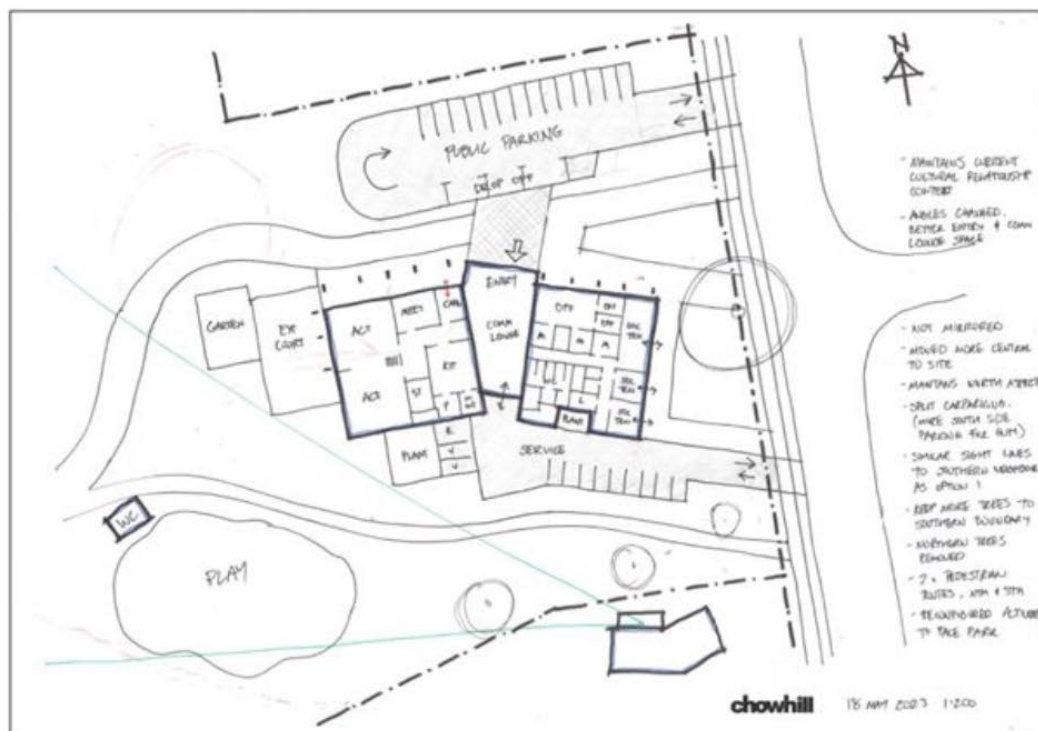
Option 1C – Building Centred on Site, Playground to southwest.
